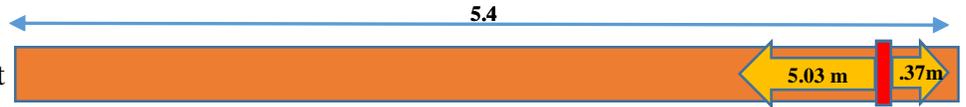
Cut one timber for use as structural roof bracing. Trim one side so it can fit into an angle.
